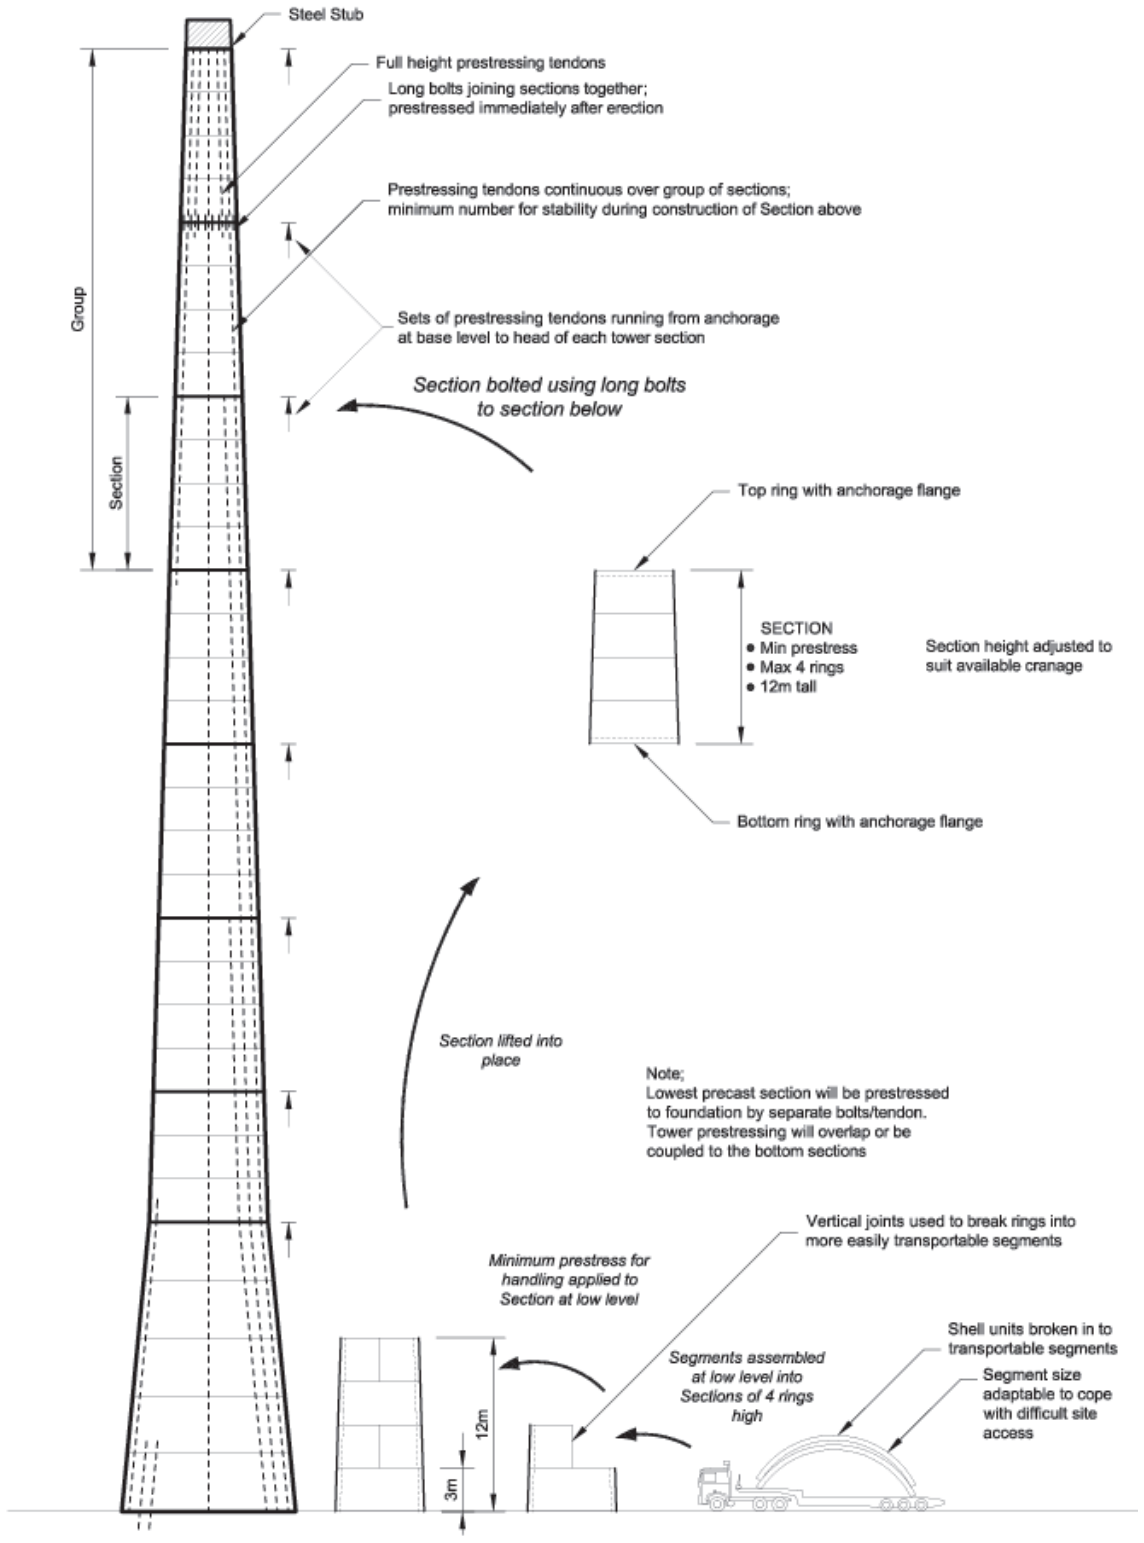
The Concrete Center 328ft construction. (The Concrete Center, 2007)
